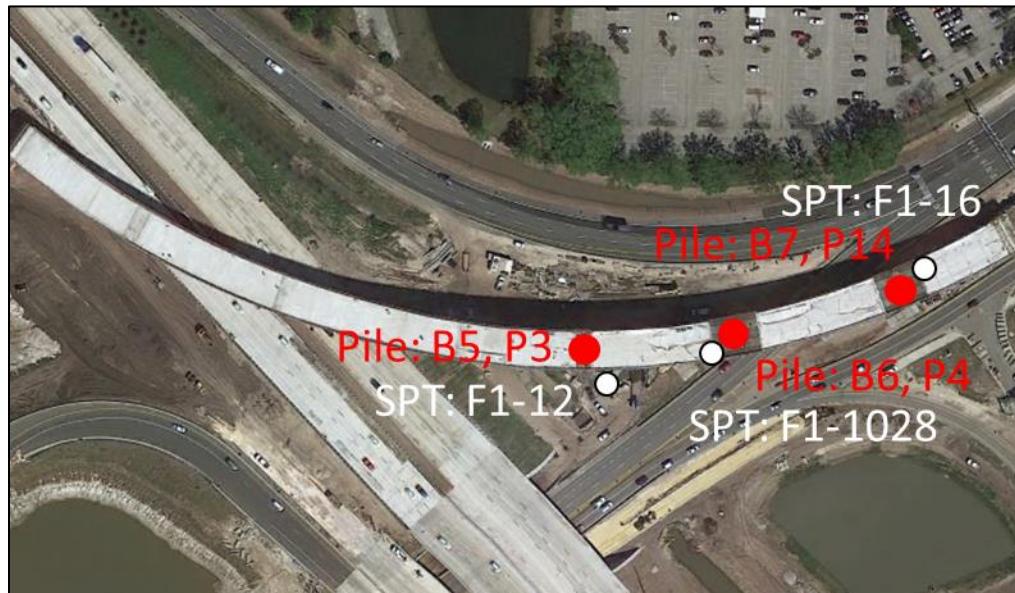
Test pile and SPT boring locations for JTB and I-95 (Bridge 720816)
